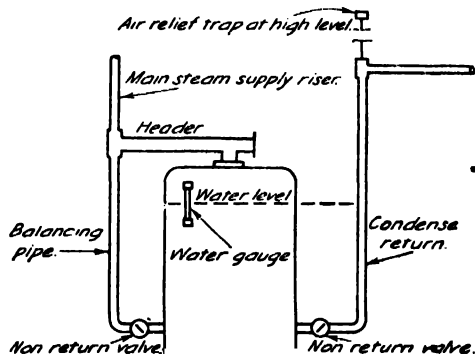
Pipe connexions to low pressure steam sectional boiler : main supply rises from header above boiler, and balancing pipe is carried down to bottom of boiler to equalize pressure; return enters boiler opposite balancing pipe.
